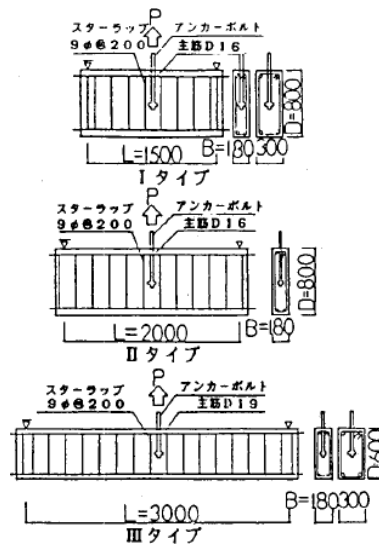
Typical test specimen in Kotani et al. (2006)
